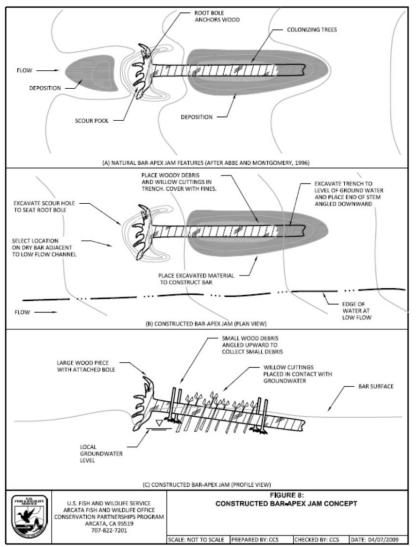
Bar apex jam schematic. Individual pieces may also be oriented vertically to promote accumulation of additional debris.
